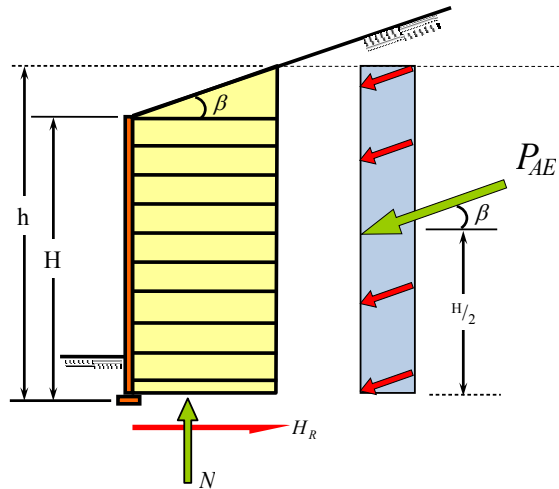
Pressure Diagram for MSE Walls with Sloping Backslope
